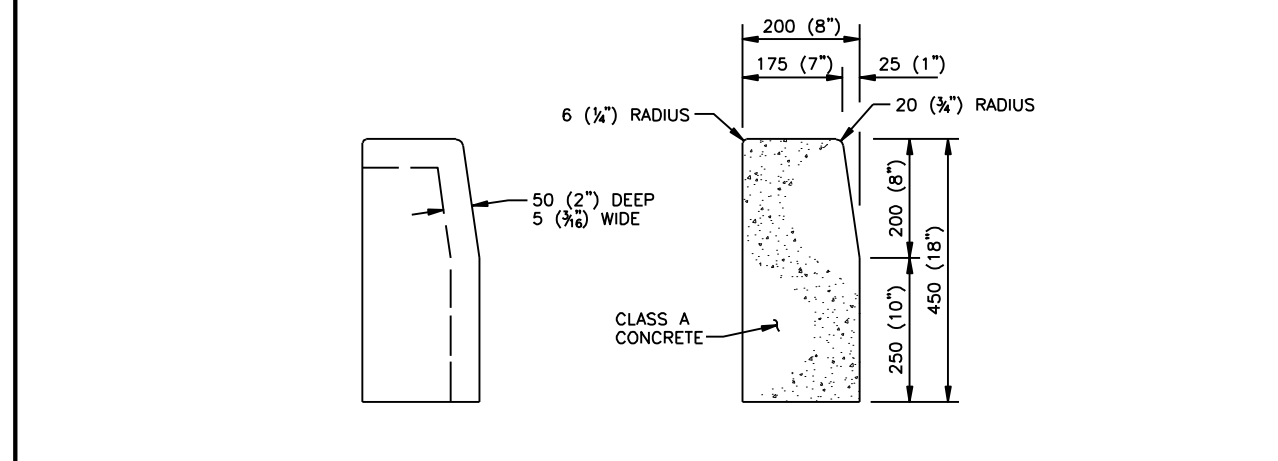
DETAIL FOR CONCRETE WHEEL STOPS NOT TO SCALE
